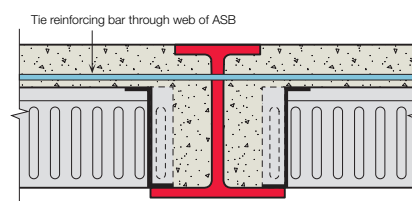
Tie bar reinforcement detail for internal beams with no concrete cover
